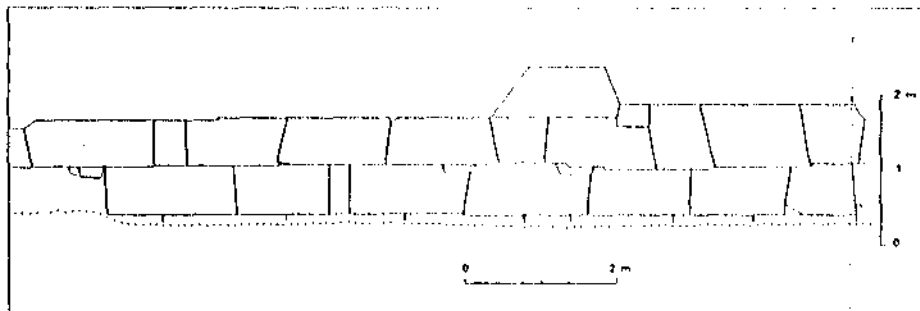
Facing blocks of the city-wall between towers 13 and 14
